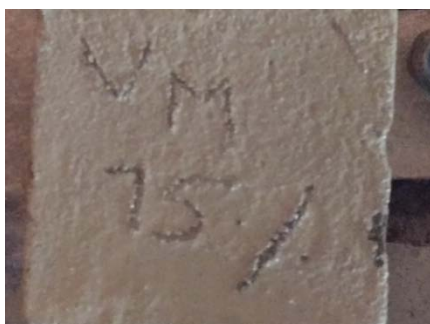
Concrete Cubes (150 mmx150 mmx150 mm)
